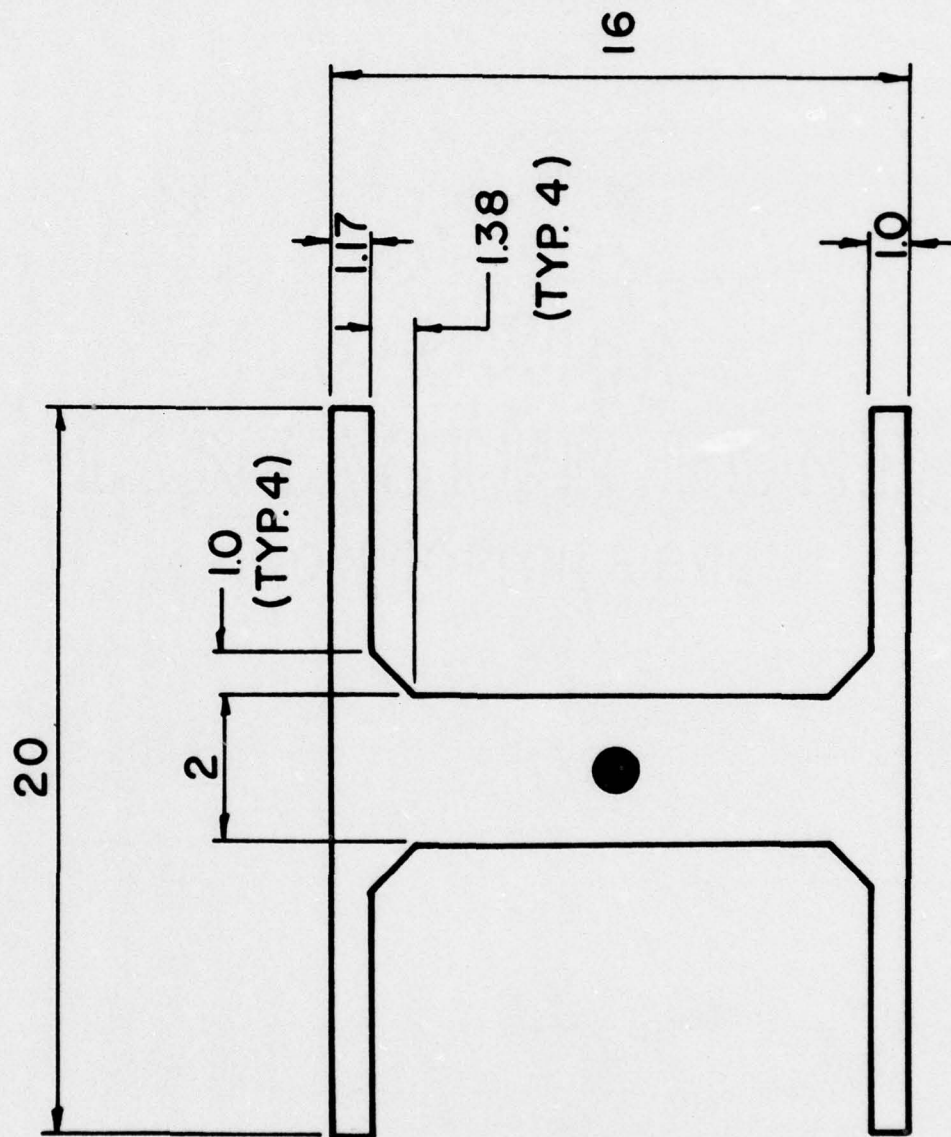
Cooper's one-sixth scale model of existing thin web prestressed bridge section
